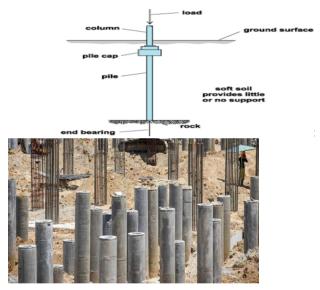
A typical pile foundation; Source: Constro Facilitator, 2021.
